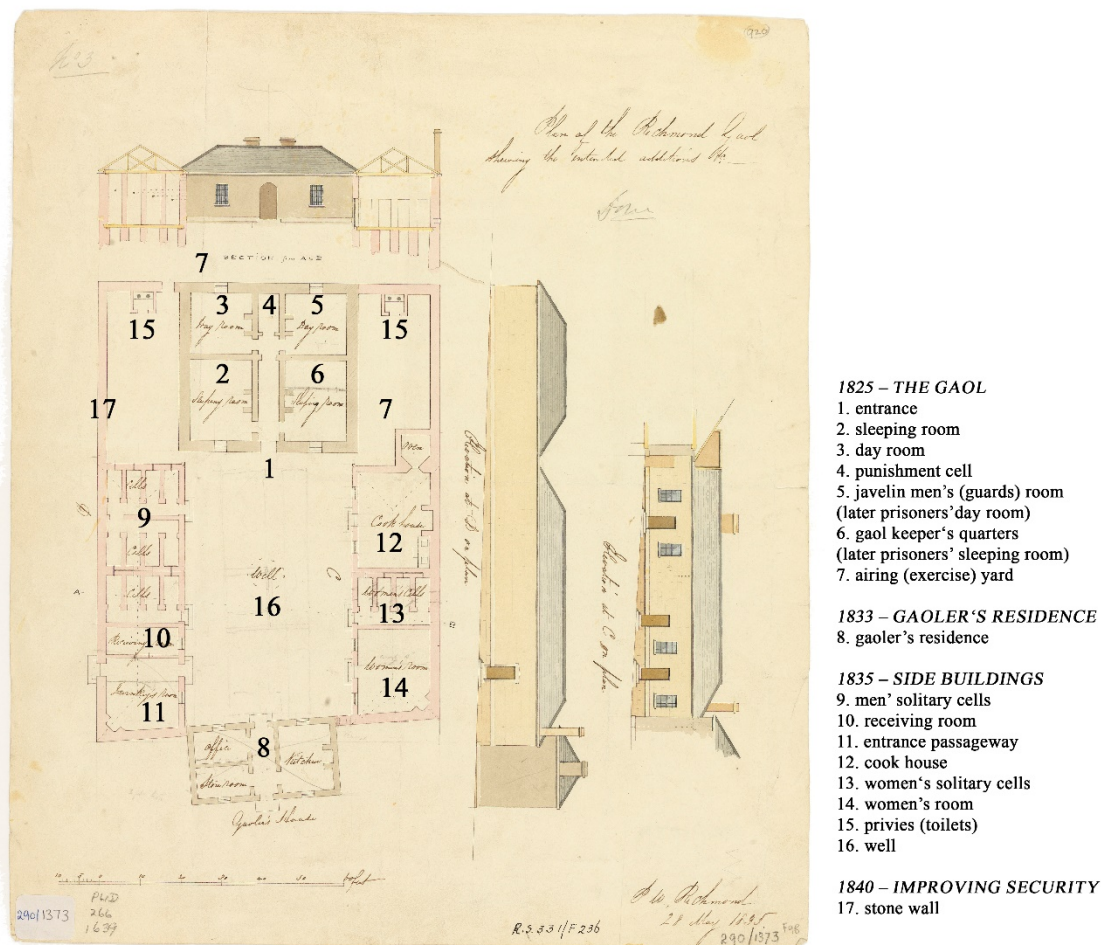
Annotated existing plan. Adapted after *The Department of Public Works* (1895).
